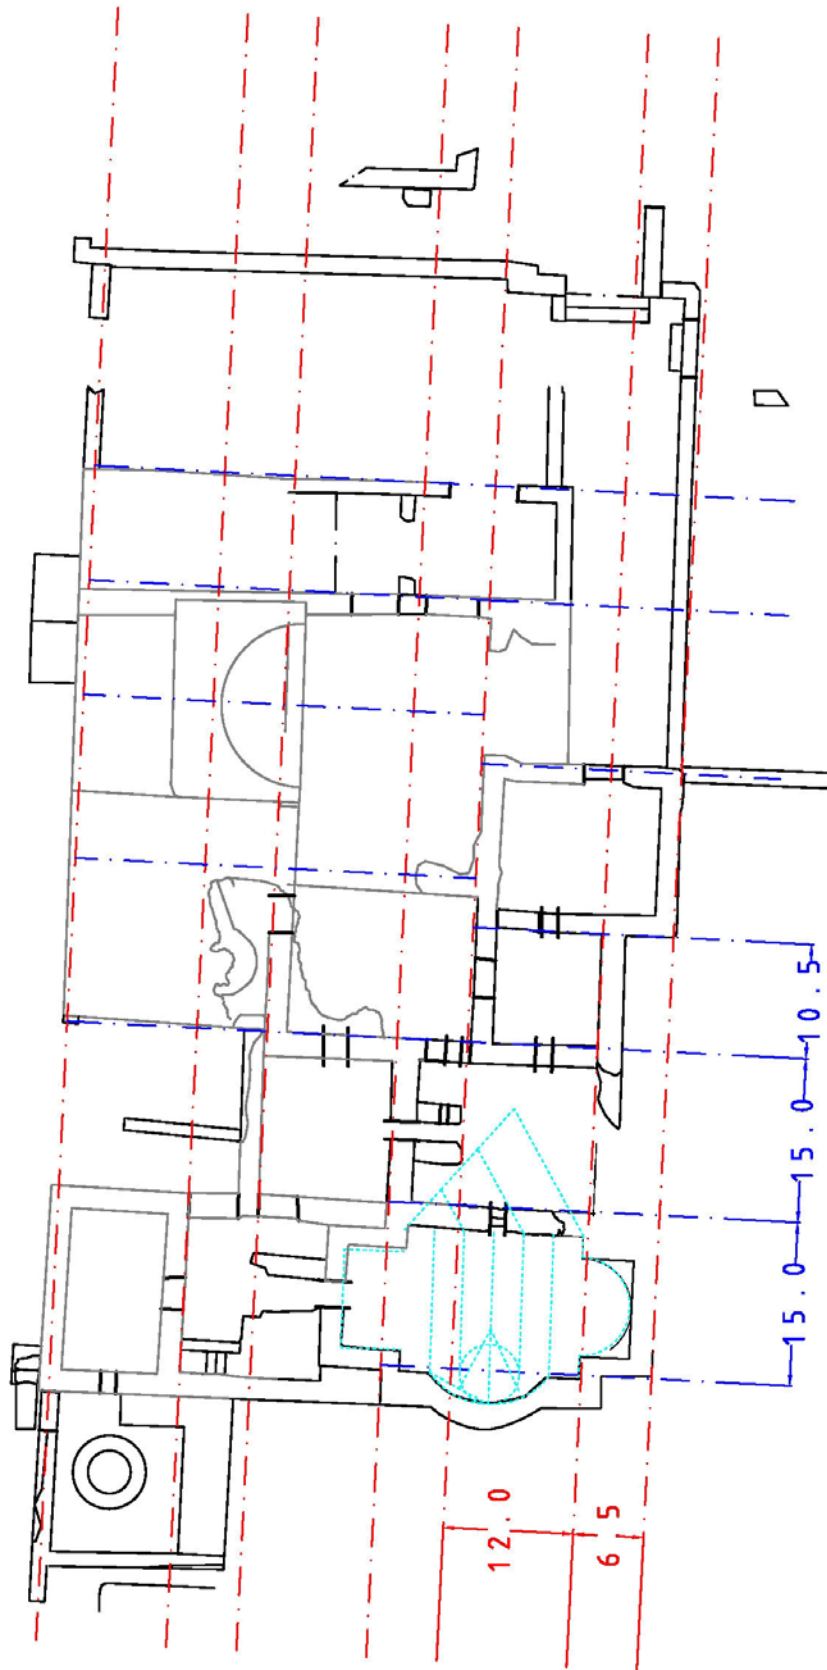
Overlay of the site plan and the reconstructed planning grid. Cyan dashed lines show possible construction of the shallow apse.
